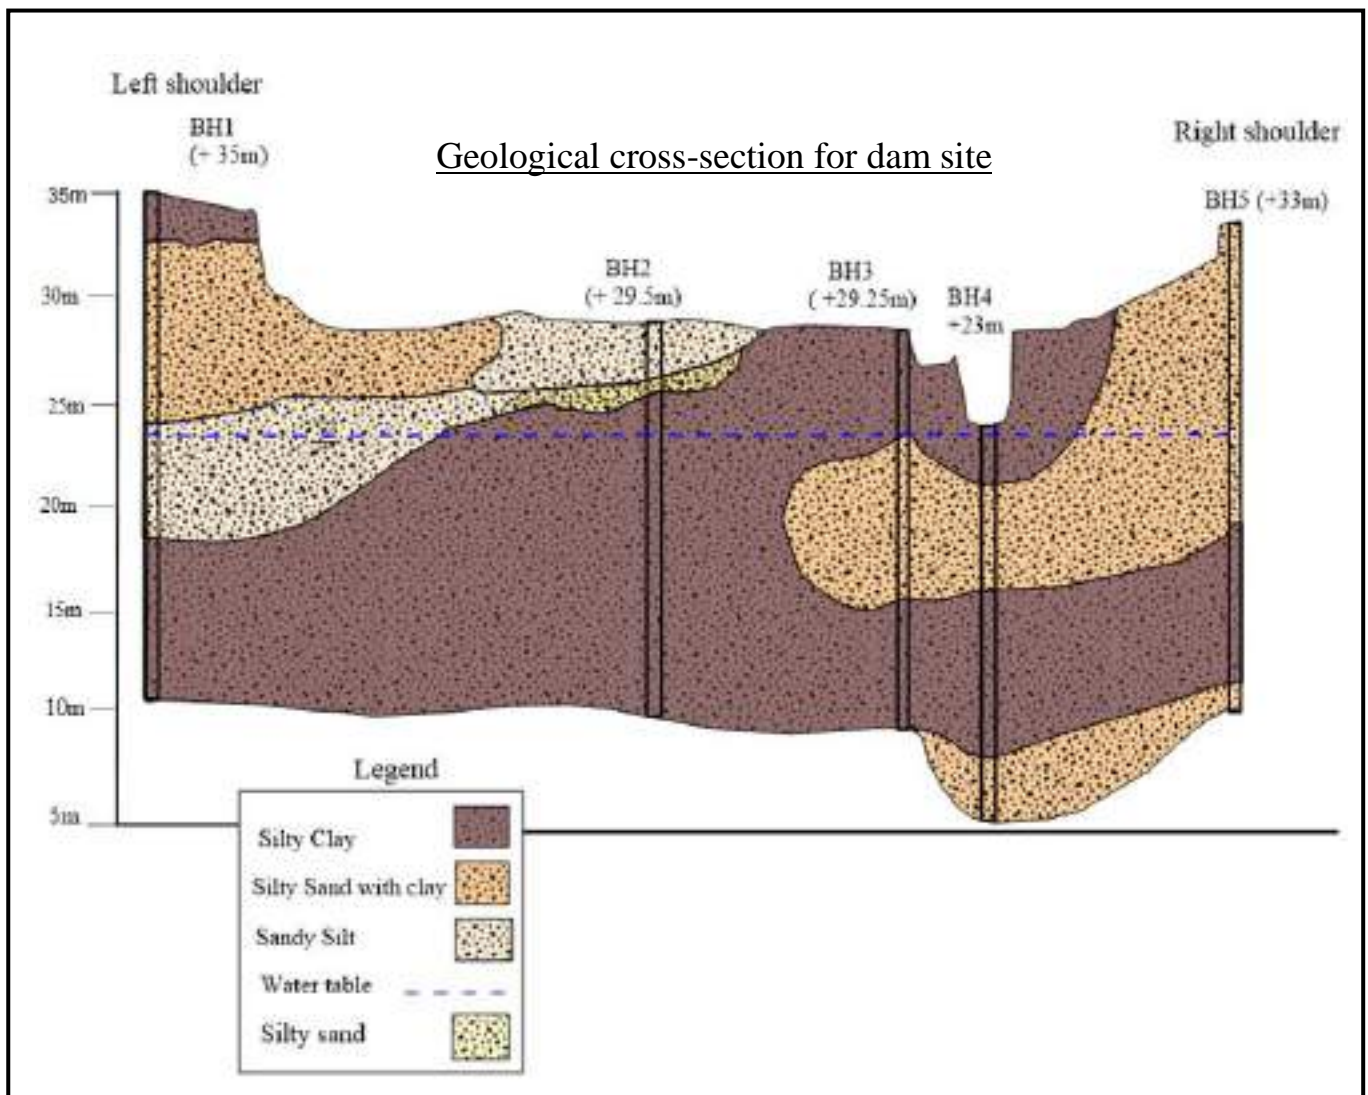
Soil section in the dam site (Missan consultant engineering bureau, 2009)
